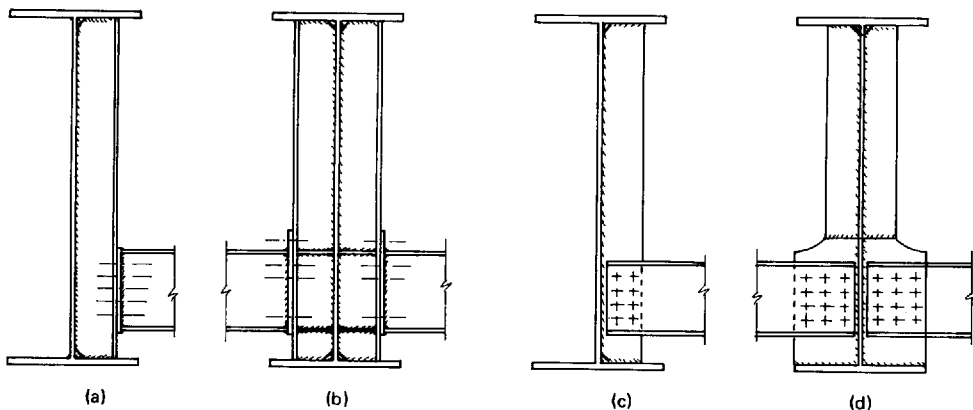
Cross-girder/main girder connections for bridges. (a) and (b) End-plate connections; (c) and (d) lapped connections
